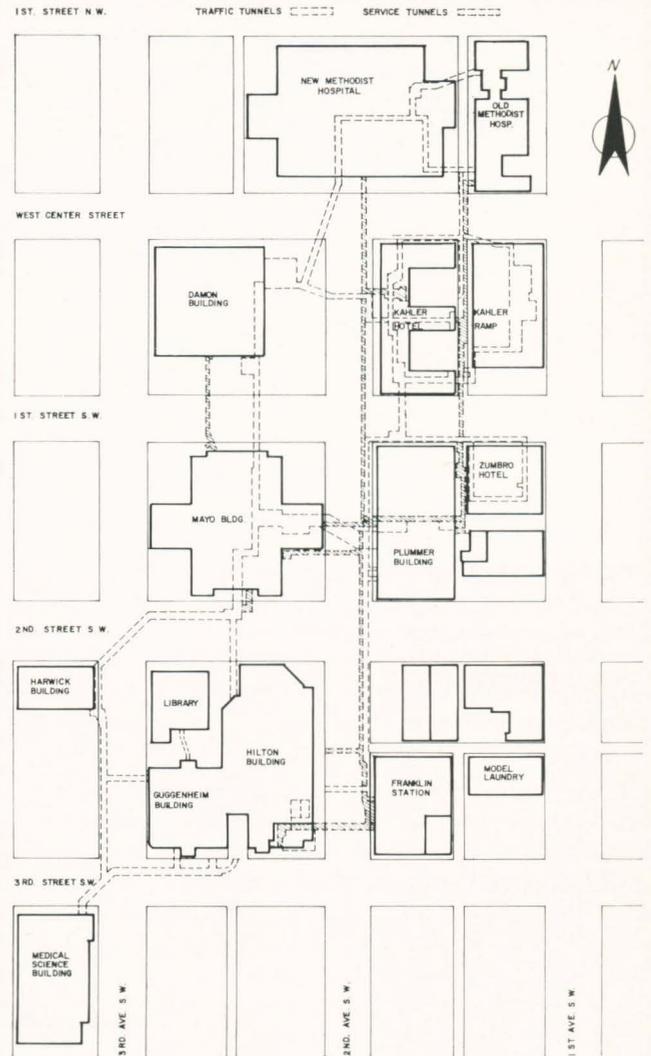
Mayo Clinic tunnels. Pedestrian tunnels provide patients with sheltered access to all buildings. Separate tunnels are used for utilities. (Schematic courtesy of ELLERBE Architects and Engineers)
